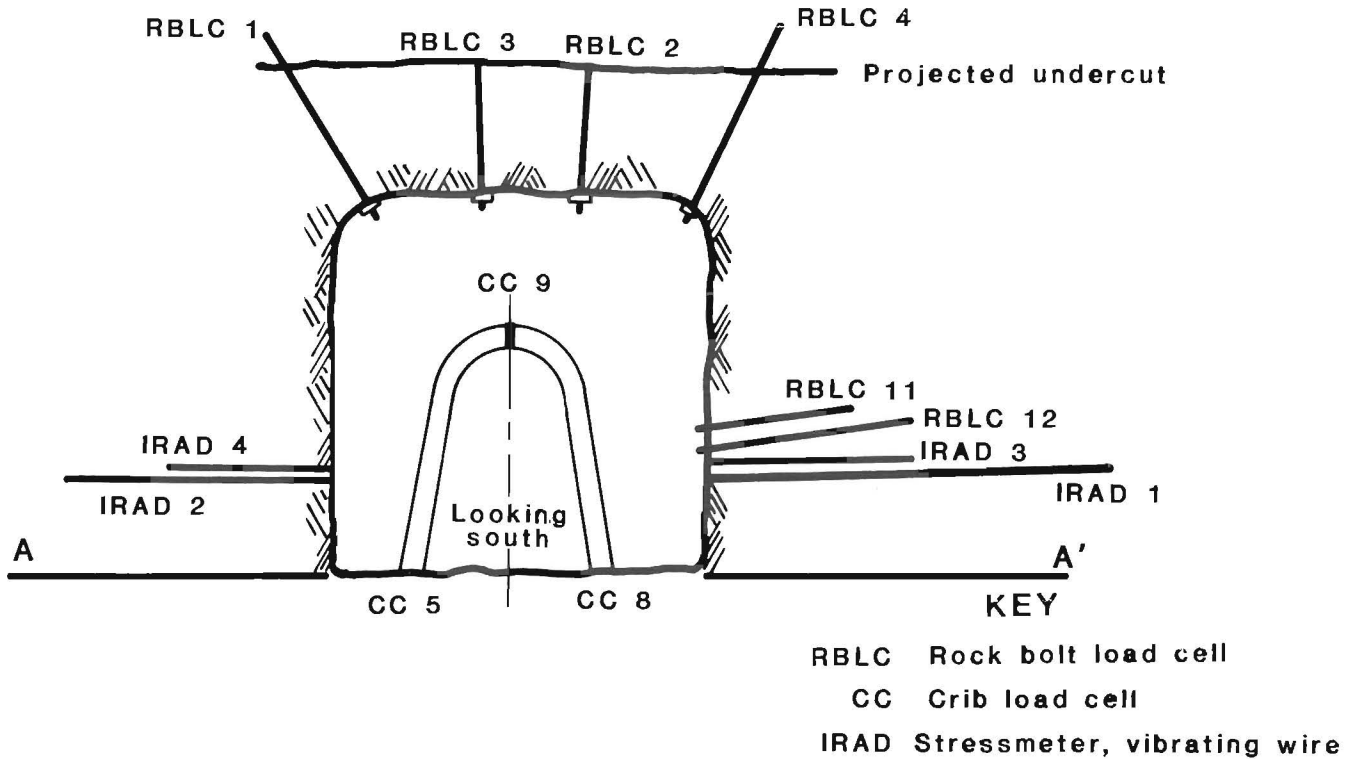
Vertical section A-A' of instrumentation plan, 2315 grizzly level.
